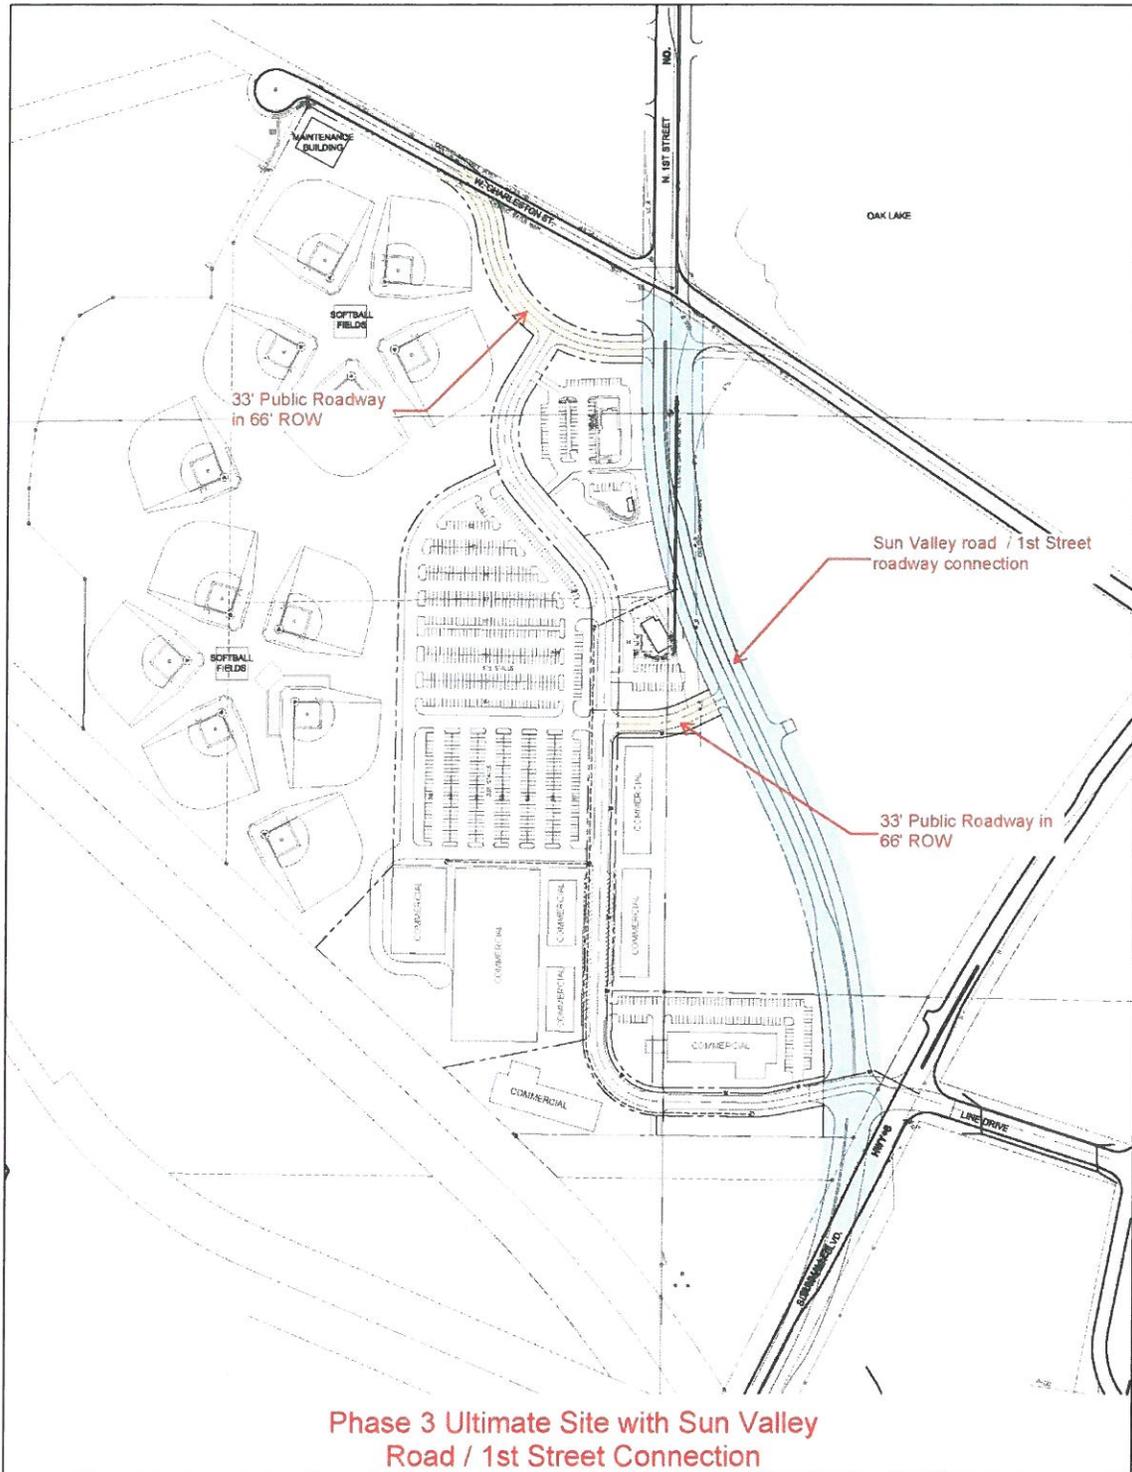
West Haymarket Sports Park Proposed Site Plan: Phase 3
